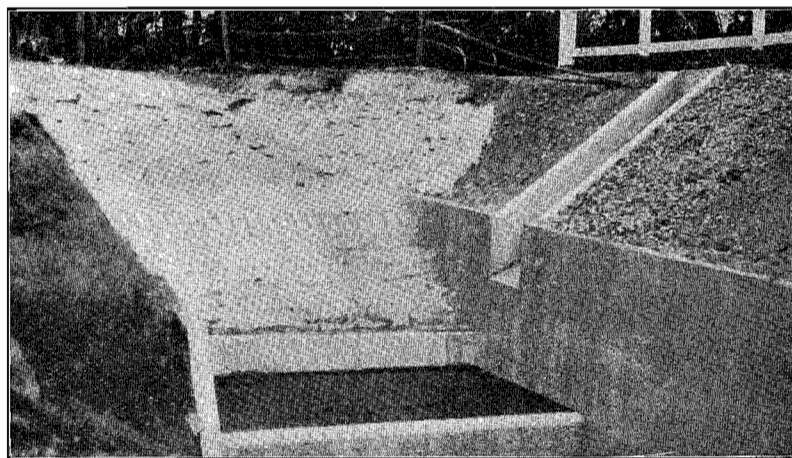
Site as above with concrete drop structure and retaining wall.
